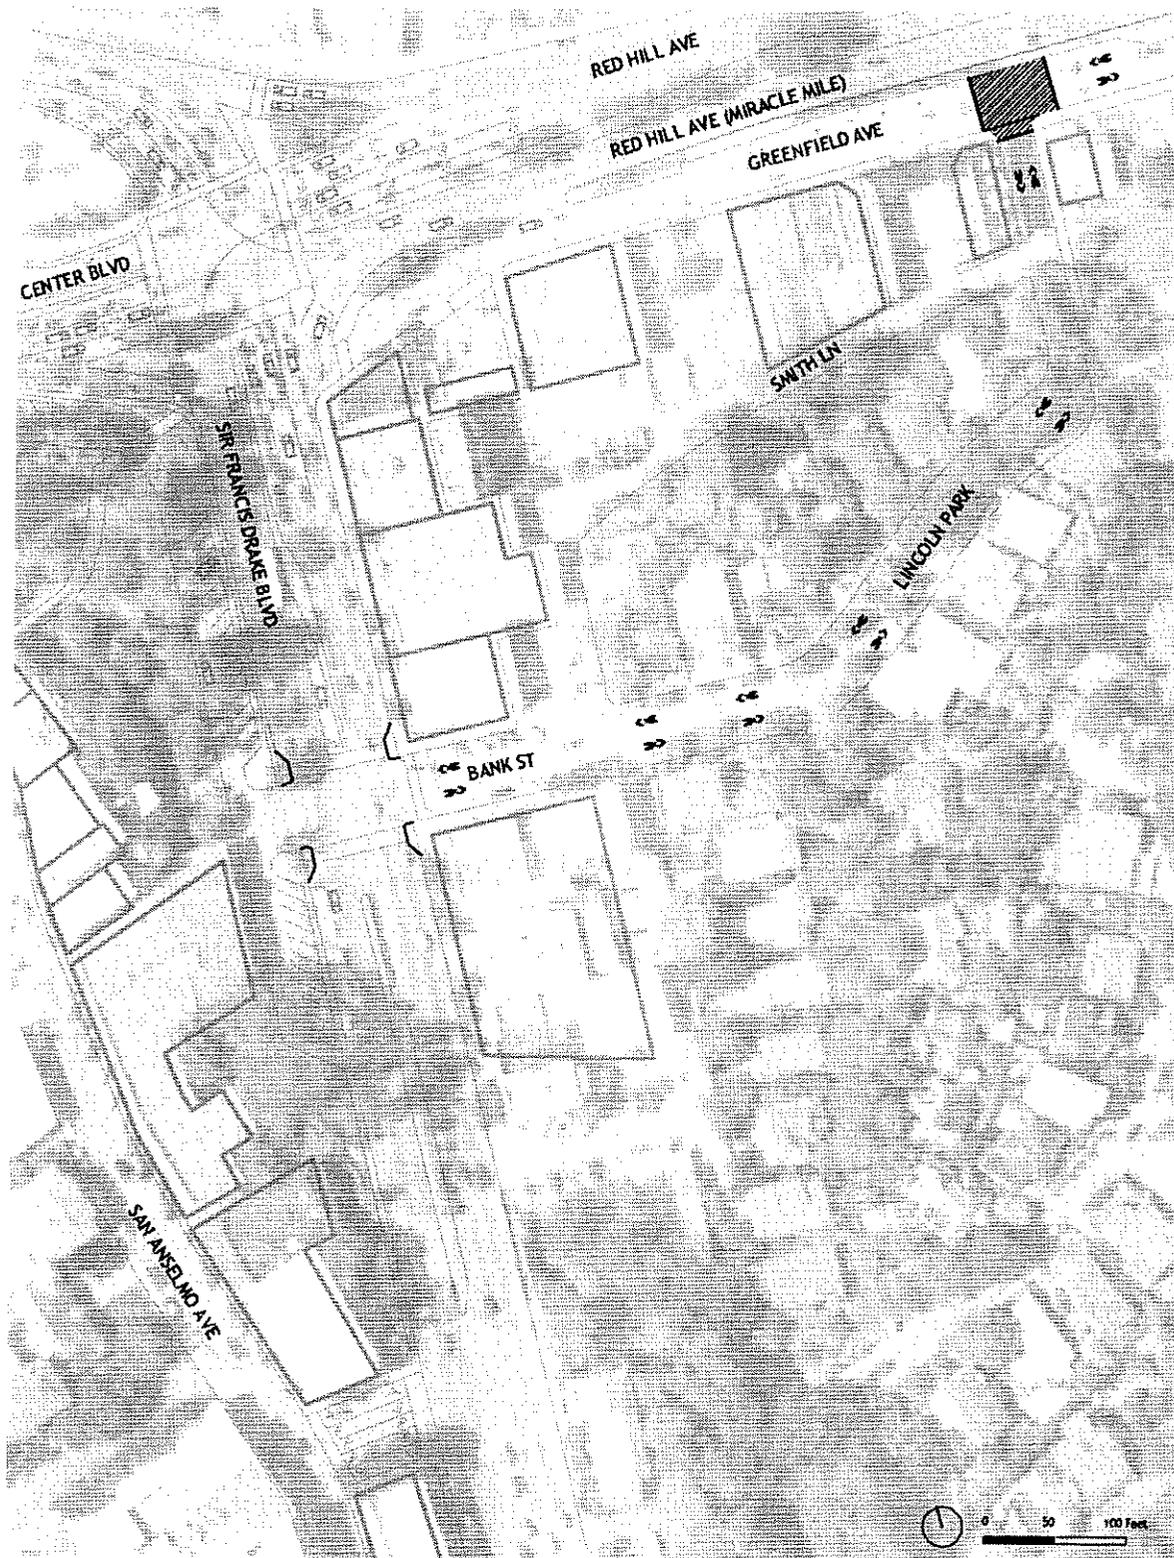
Plan View of Proposed Improvements for Project 9: The Hub to Hilldale Drive (Short-Term)
